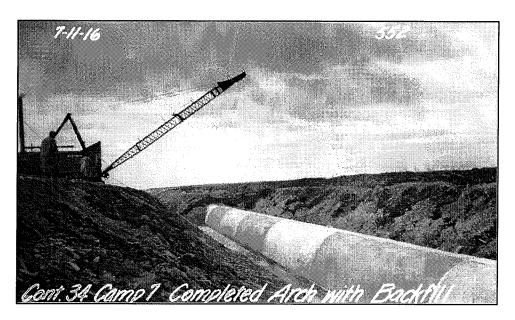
Cut and cover construction. (Construction Photograph No. 552)
